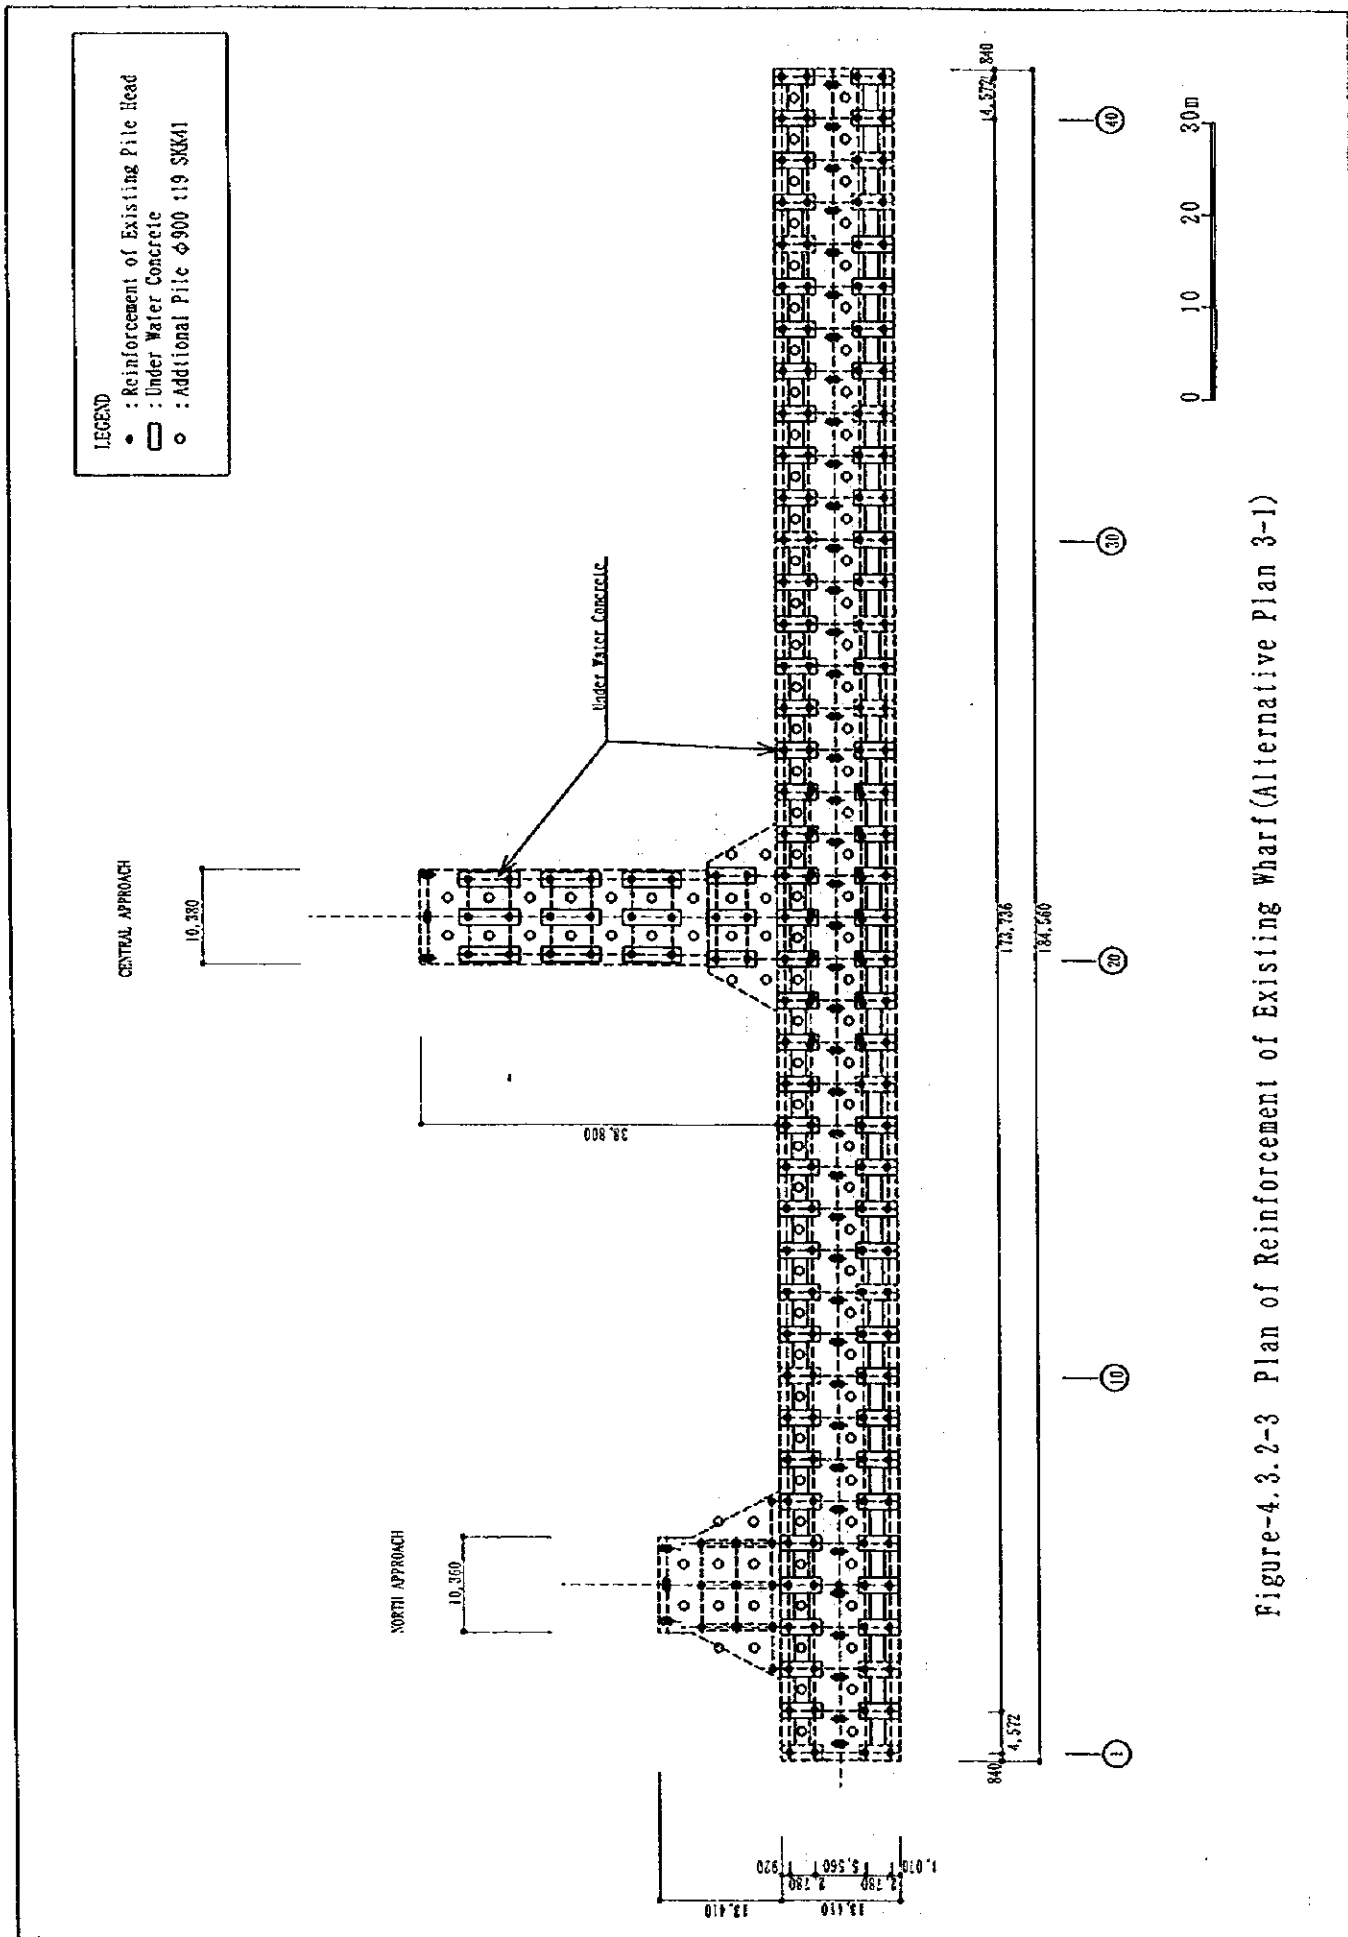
Plan of Reinforcement of Existing Wharf (Alternative Plan 3-1)
